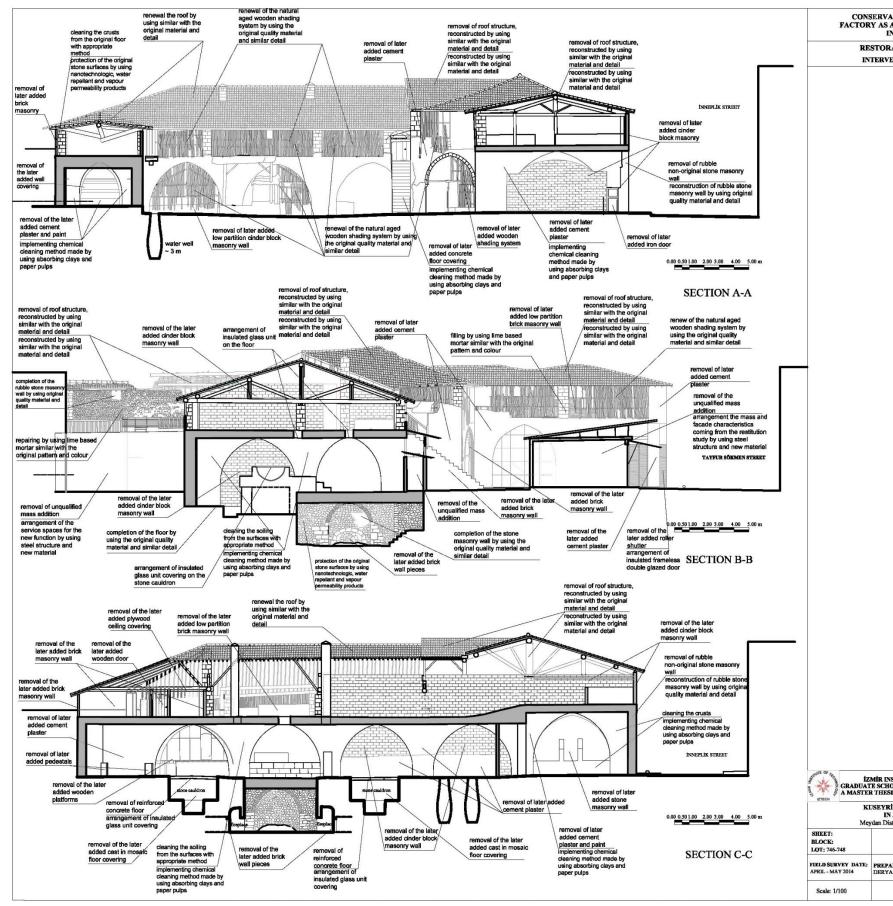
Intervention decisions – Section A-A, Section B-B section and Section C-C
